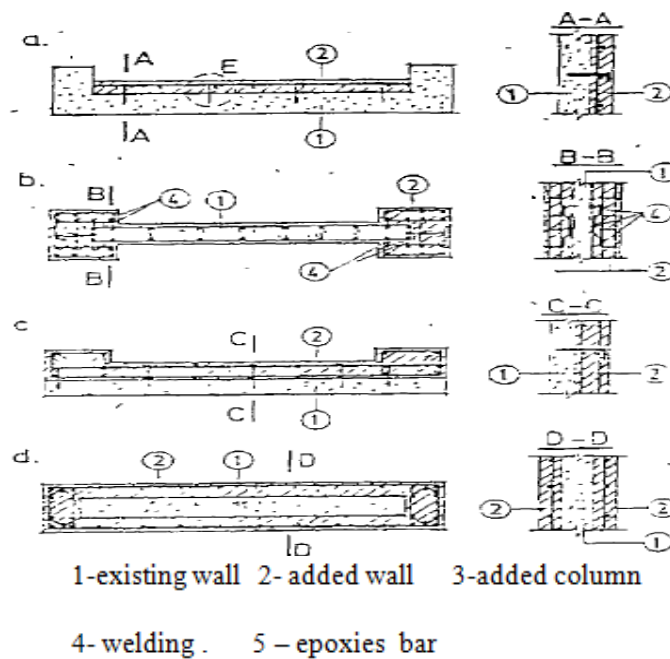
Adding Strength to existing Concrete Shear Wall
